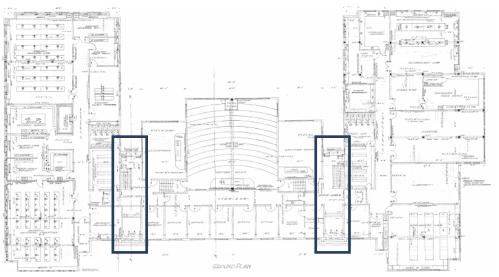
Ground plan highlighting the sections of building torn down for firewall installation
